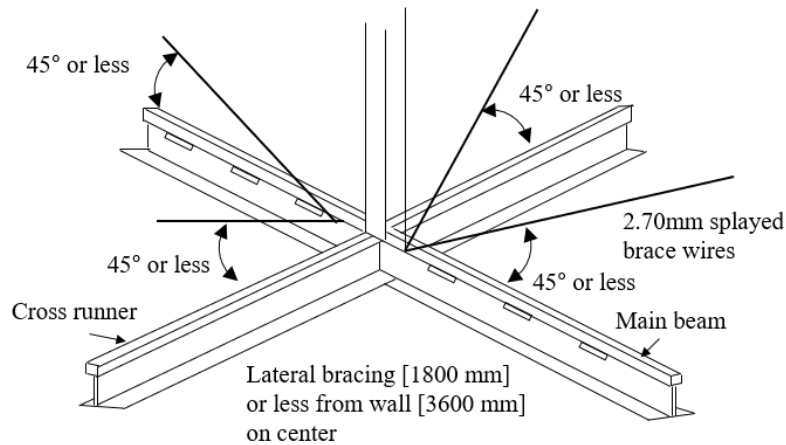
Lateral bracing requirement for large area ceiling installed on SDC D, E, and F building (ASTM E580)
